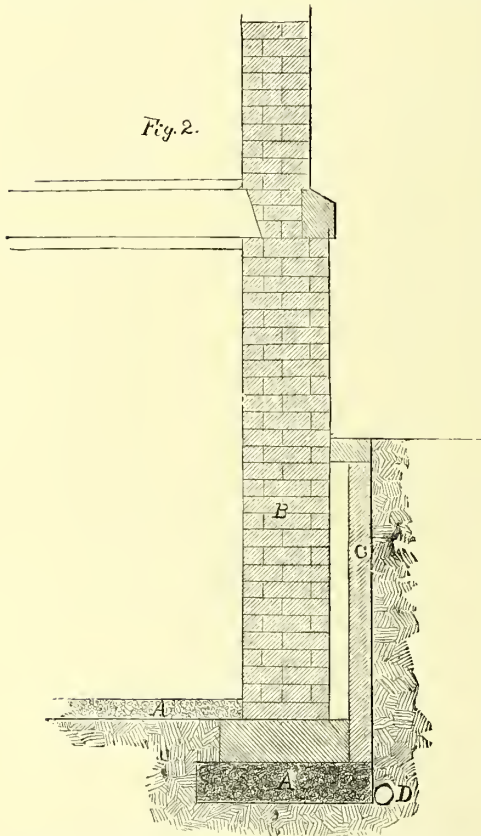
A, A, concrete; B, the wall of the building; C, the independent wall; D, drain-pipe at the bottom of the foundation.
